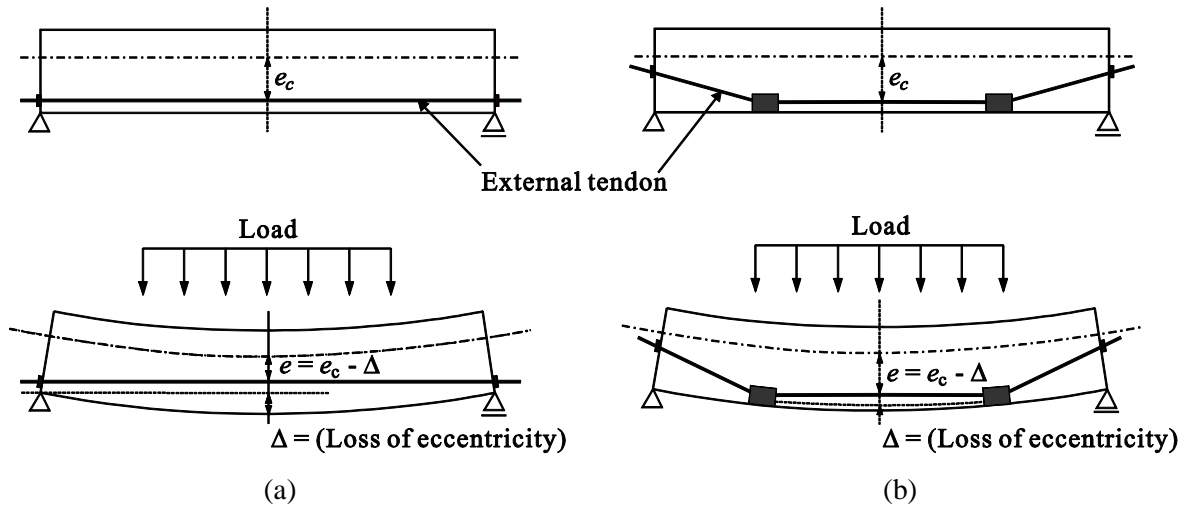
Deflection and loss of eccentricity in an externally prestressed concrete beam
